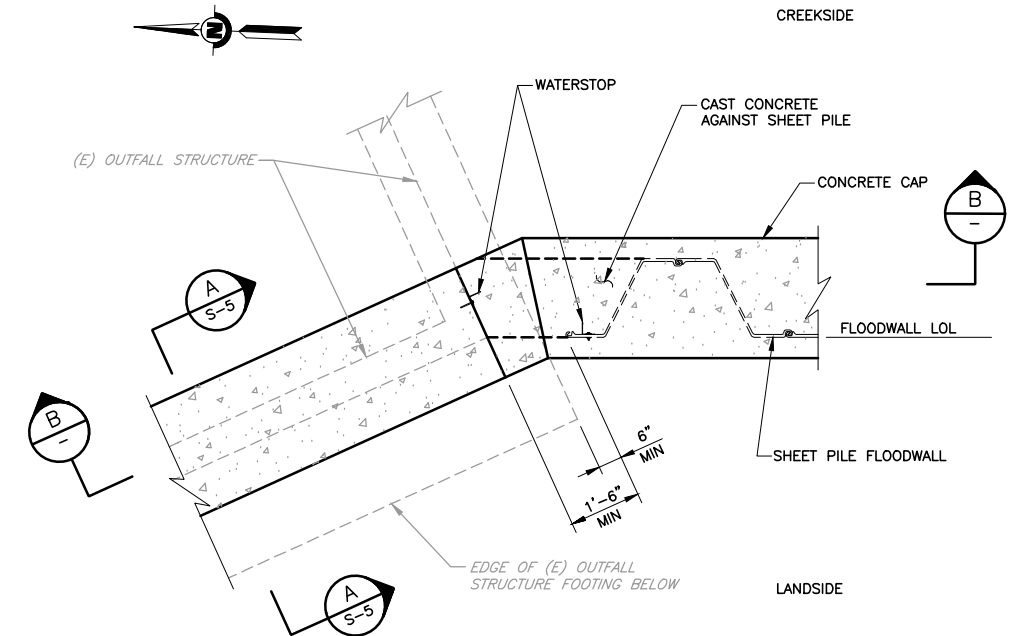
PARTIAL PLAN - (R-LINE) STA 29+98.16
